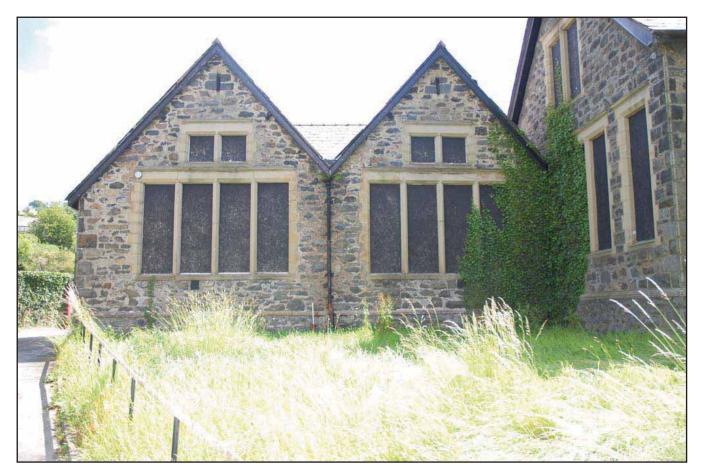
Extension B (Old Grammar School Block) - west facing elevation. Scale: 1.0m
